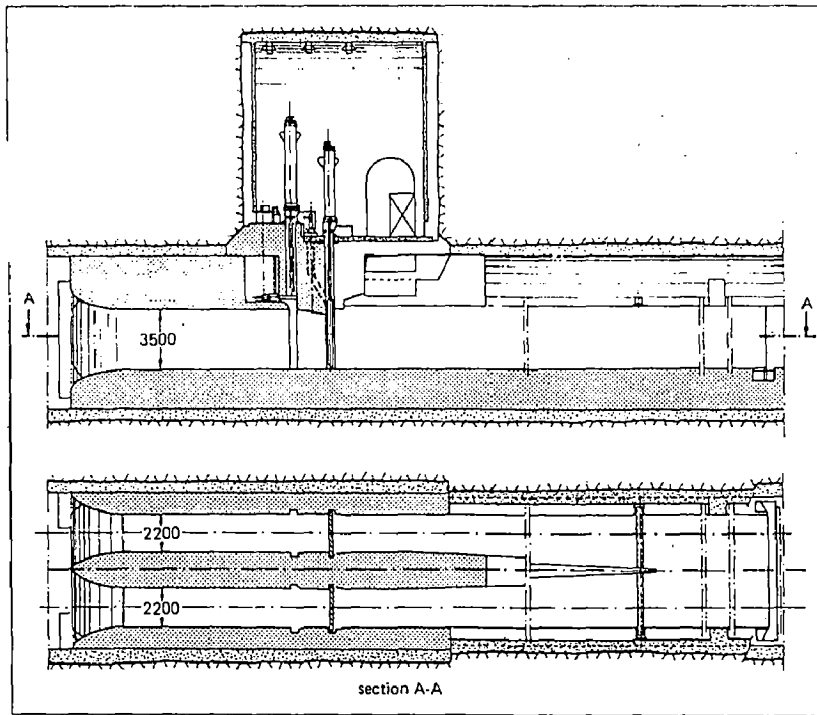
Alicura's bottom cutter structure in plan and section.
